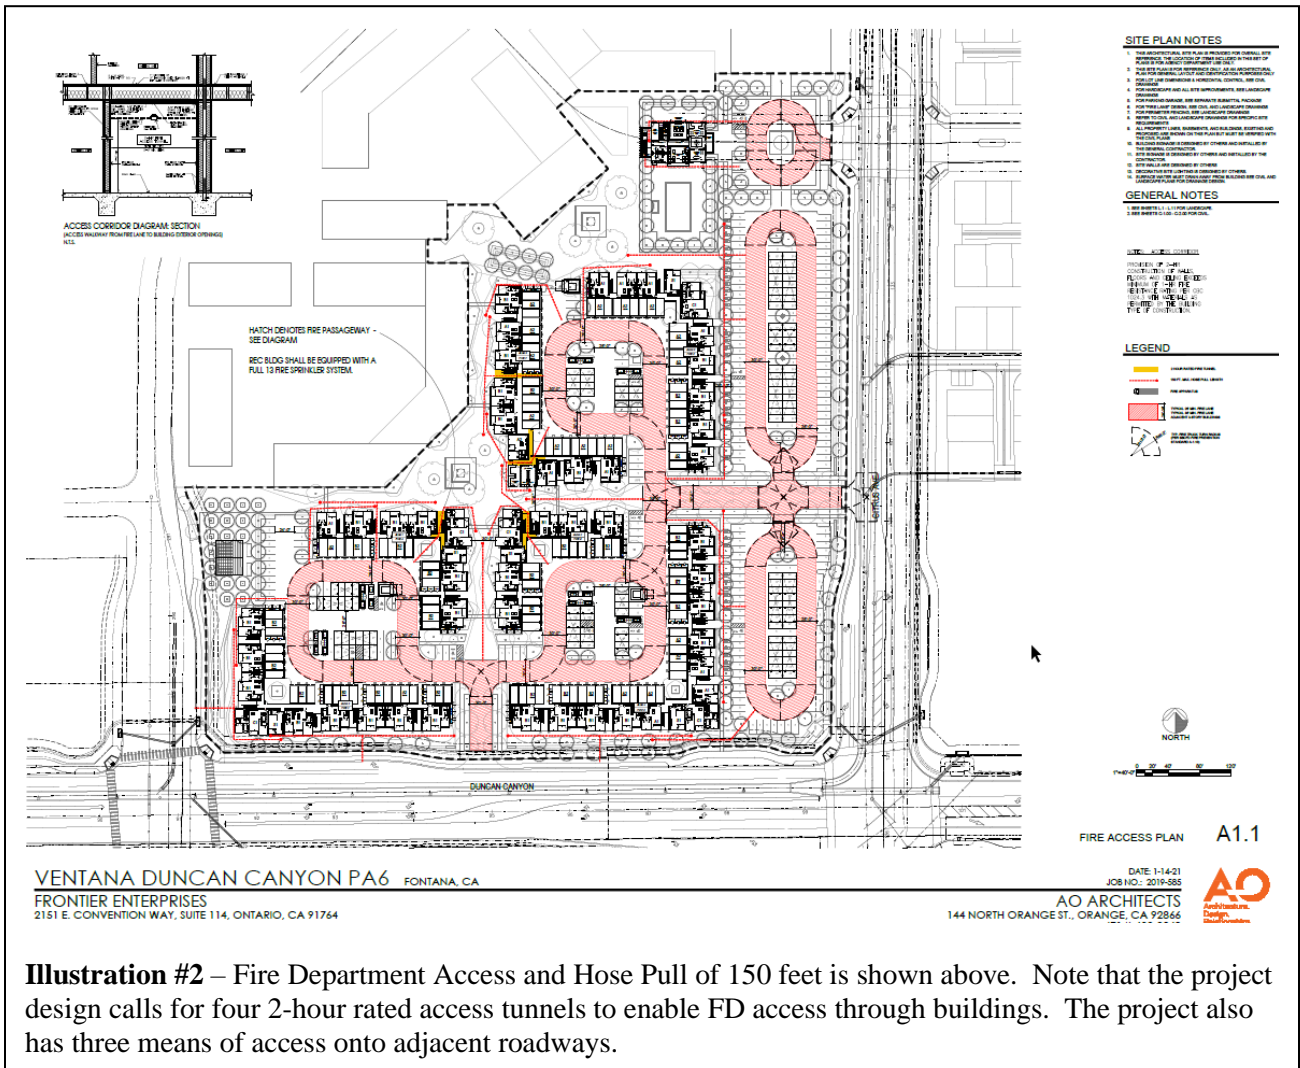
Fire Department Access and Hose Pull of 150 feet is shown above. Note that the project design calls for four 2-hour rated access tunnels to enable FD access through buildings. The project also has three means of access onto adjacent roadways.
